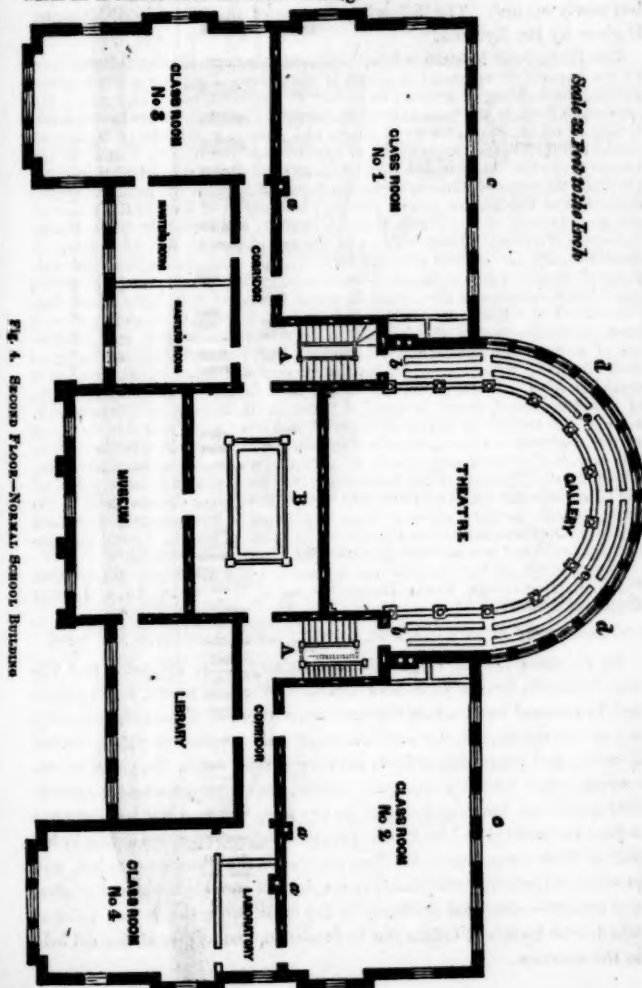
SECOND FLOOR—NORMAL SCHOOL BUILDING
